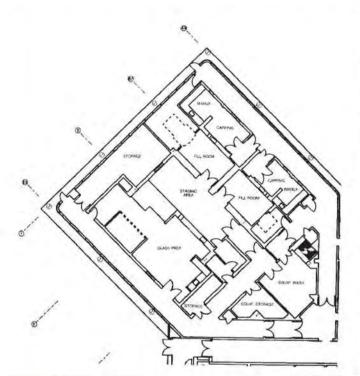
Floor plan of aseptic filling rooms and staging room with adjacent support areas (courtesy, Glaxo).
